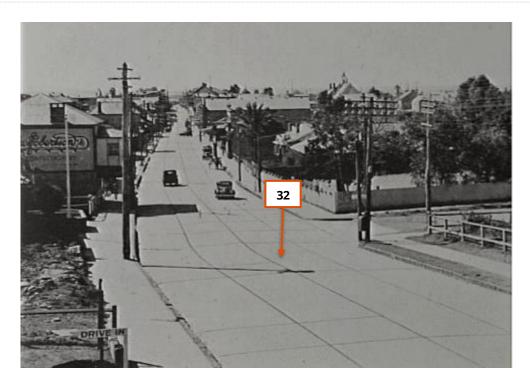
1939 photograph of George Street following reconstruction in cement concrete [32] (Source: Hawkesbury Museum)
